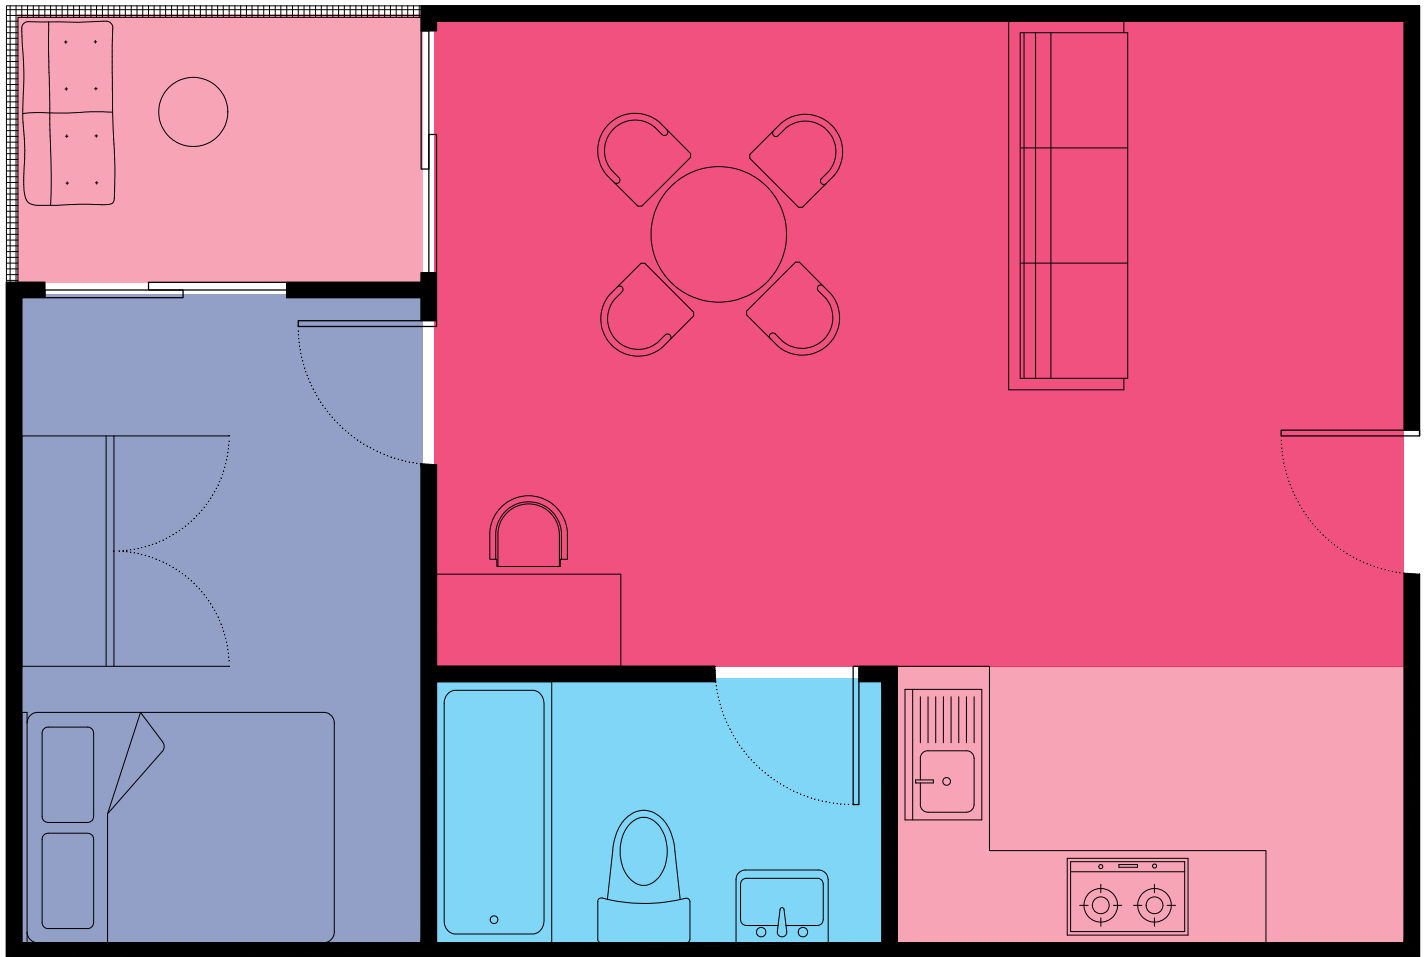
Tiny House Floorplan Concept, 600 ft²
